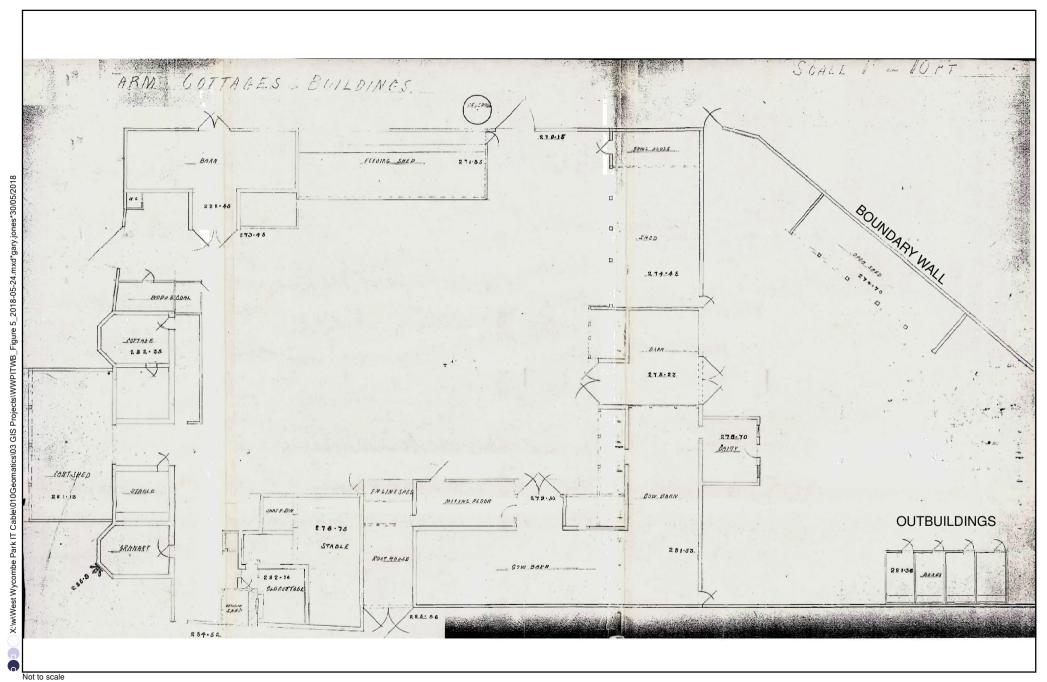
Park Farm updated plan from the Vernacular Buildings Survey report
